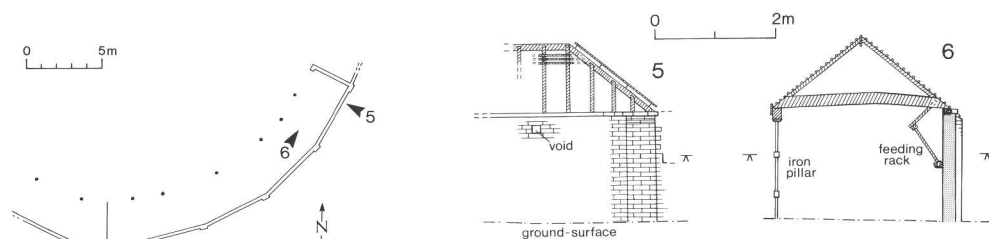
Calke Park: ground-plan, elevation and section (numbered as in the plan) of the feeding-shelter at the south end of the deer-enclosure, recorded by RS; timbers are hatched; the back wall is stippled in section; scale of plan 1:500, scale of elevation and section 1:125.
